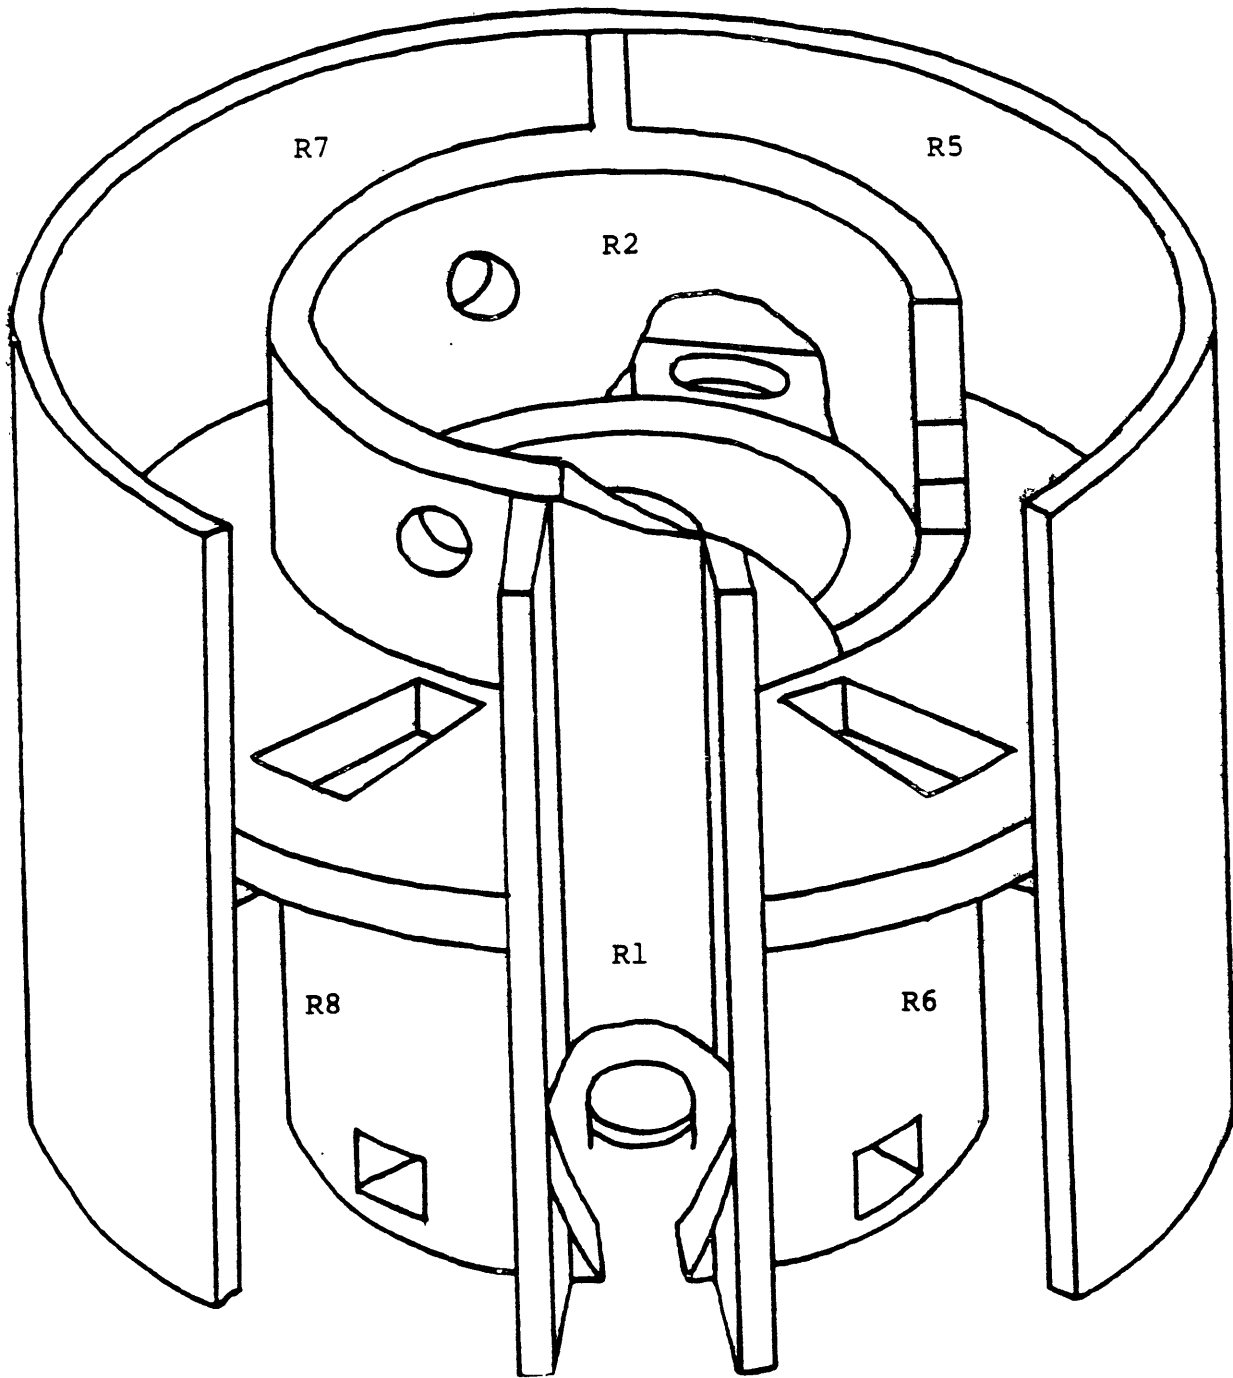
THREE DIMENSIONAL VIEW OF BATTELLE
